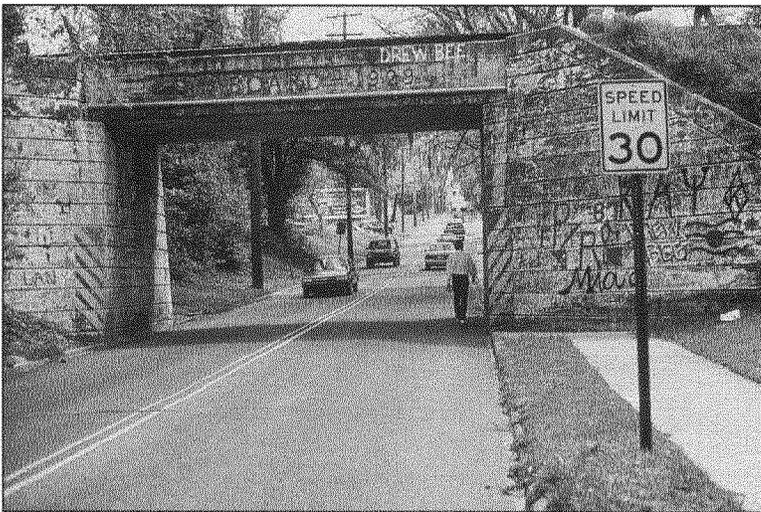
Poorly planned sidewalks can place pedestrians at risk.
